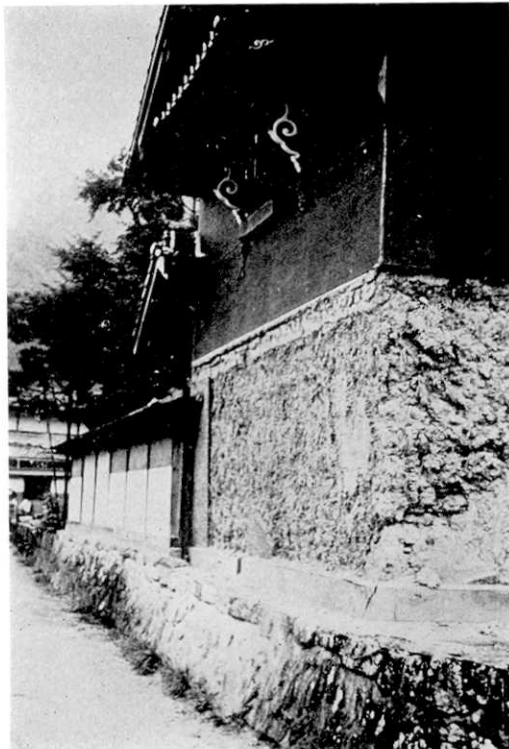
Failure of the warehouse wall made of mud. (Kera section, Okumyogata)
